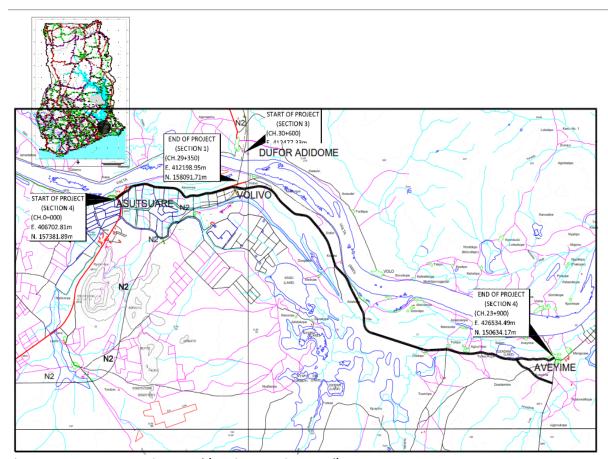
Asutuare – Aveyime Road (Section 2 Project Road)
